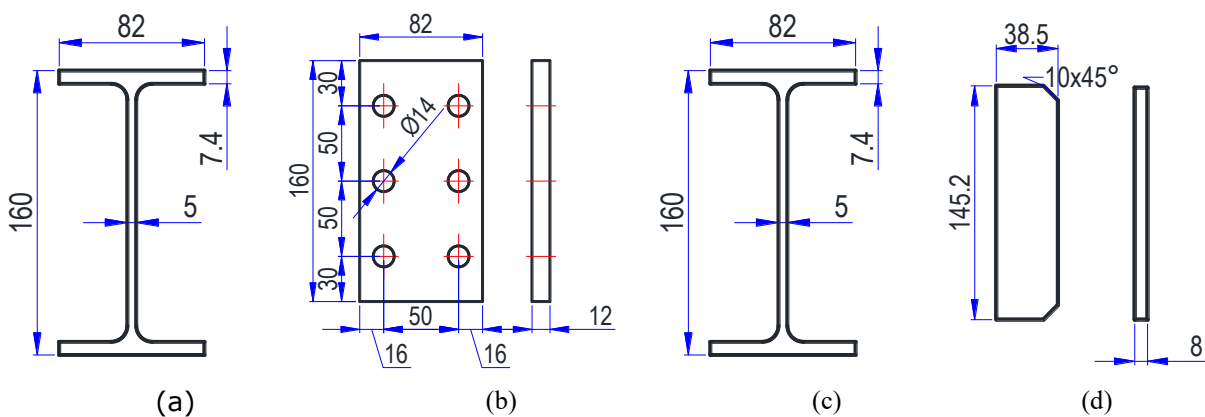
Dimensions of the elements of the assembly tested: (a) beam cross section; (b) end plate; (c) column cross section; (d) stiffeners.
